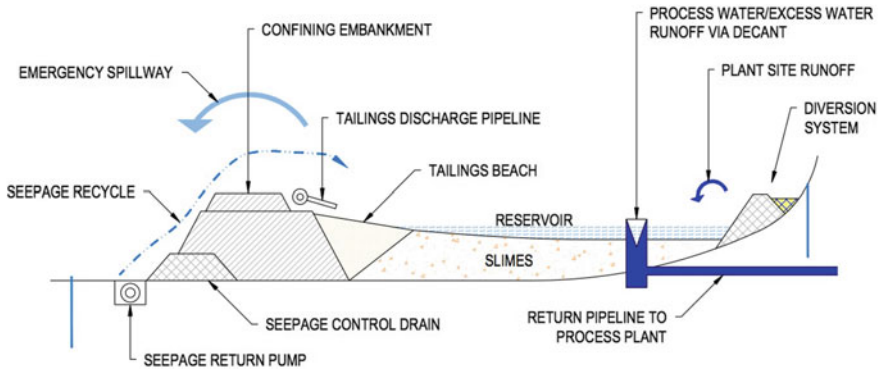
Typical section through a tailings management facility (Cambridge 2012a, b)
